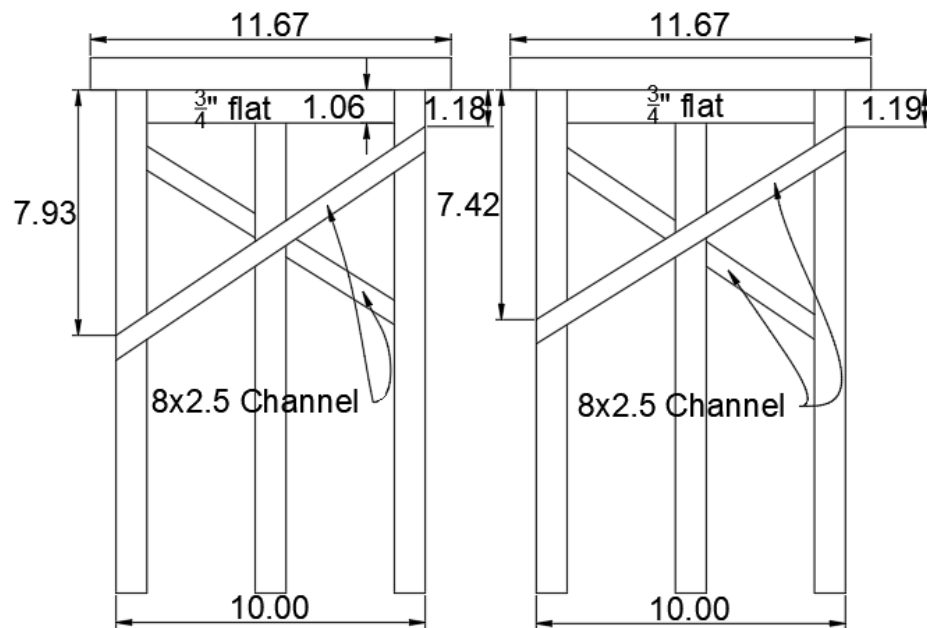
Details of the spur bridge Pier 2 (central pier) on the left bank. The left detail is the side closer to the embankment, the right closer to the channel. Note that this is the only pier with three vertical I-beams instead of four.
